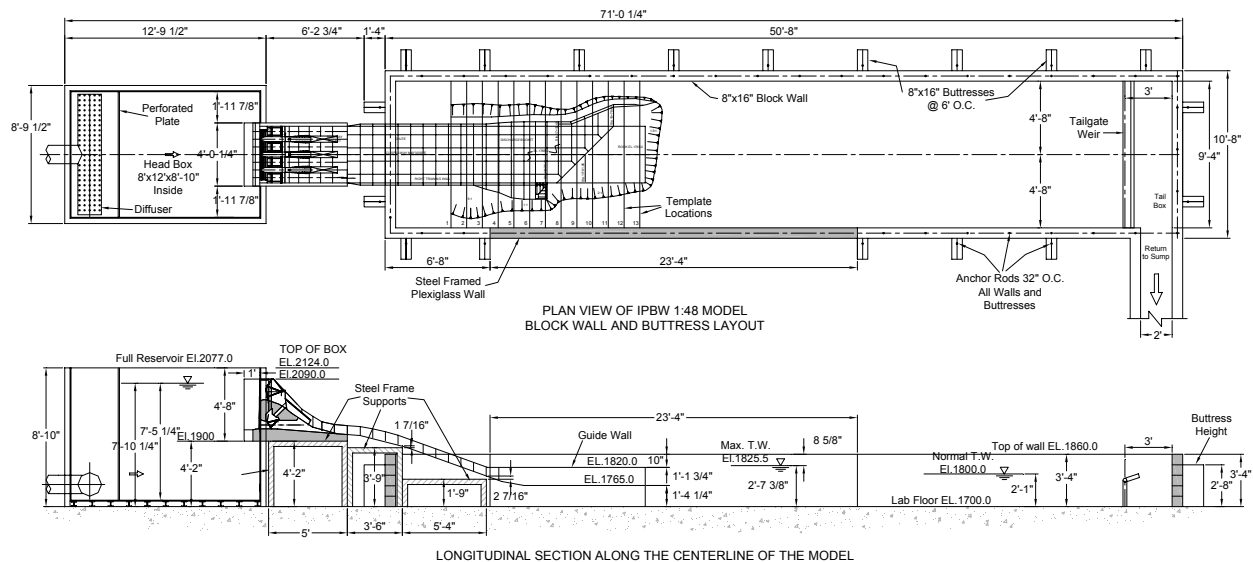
General layout of Brownlee Dam 1:48 scale two-dimensional model
